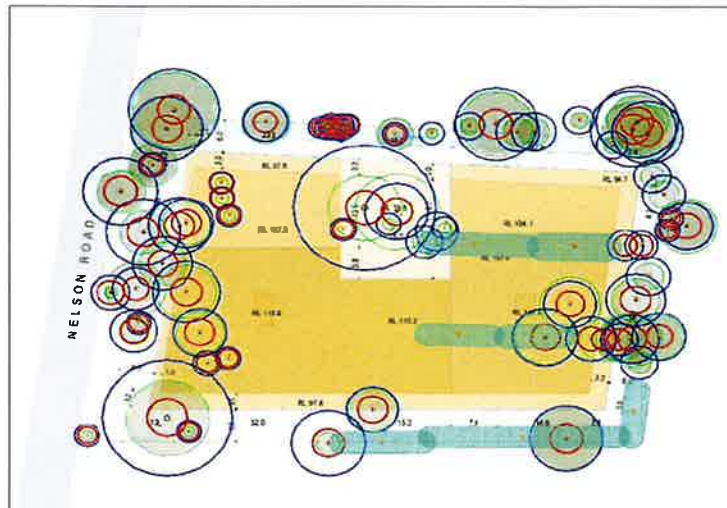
Proposed site plan showing the extent of the footprint and existing trees.
